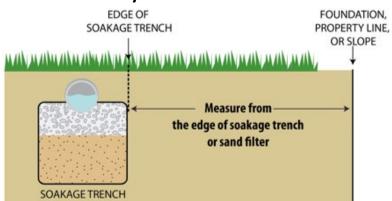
How to Measure Stormwater Facility Setbacks Surface Facility
